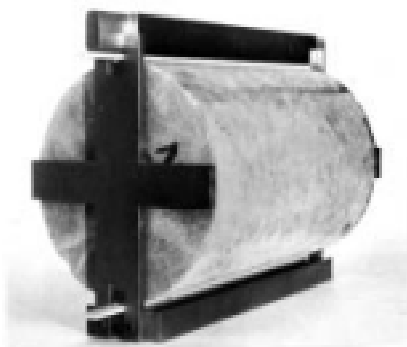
Jig for Aligning Concrete Cylinder and Bearing Strips
